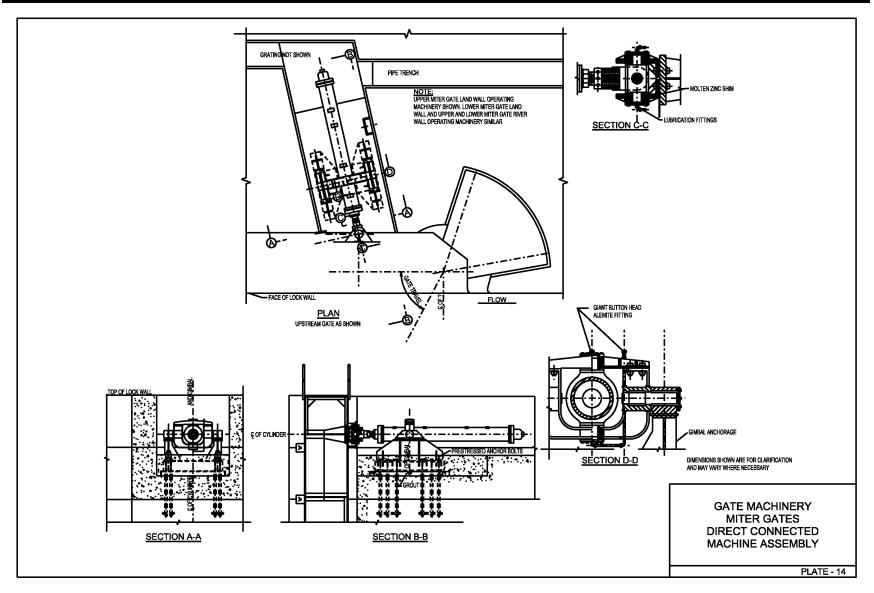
Plate 14: Gate machinery miter gates, direct connected machine assembly
